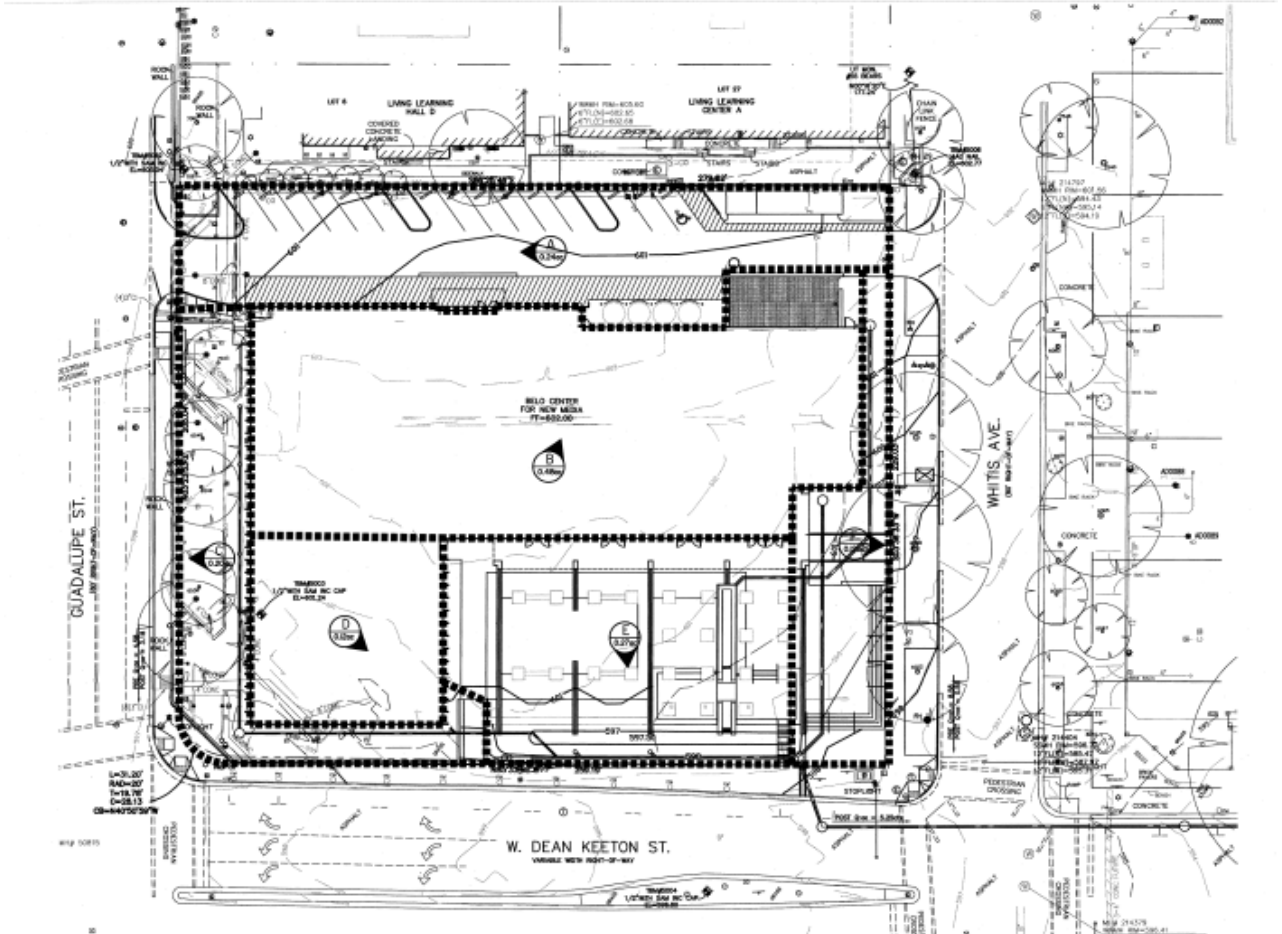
Post-Construction Conditions provided by Ten Eyck Drainage Area Plan from Construction Documents
